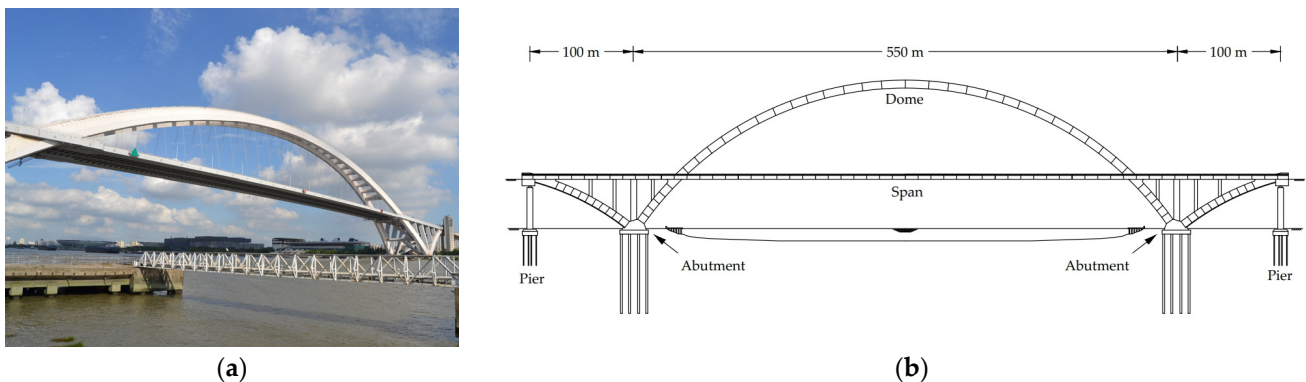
(a) A picture of the Lupu Bridge, and (b) elevation view of the bridge with main dimensions.
